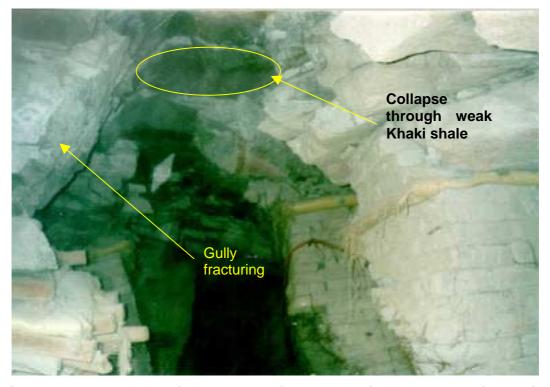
Basal Reef – collapse of gully hangingwall due to fracturing developed around leading ASG heading
